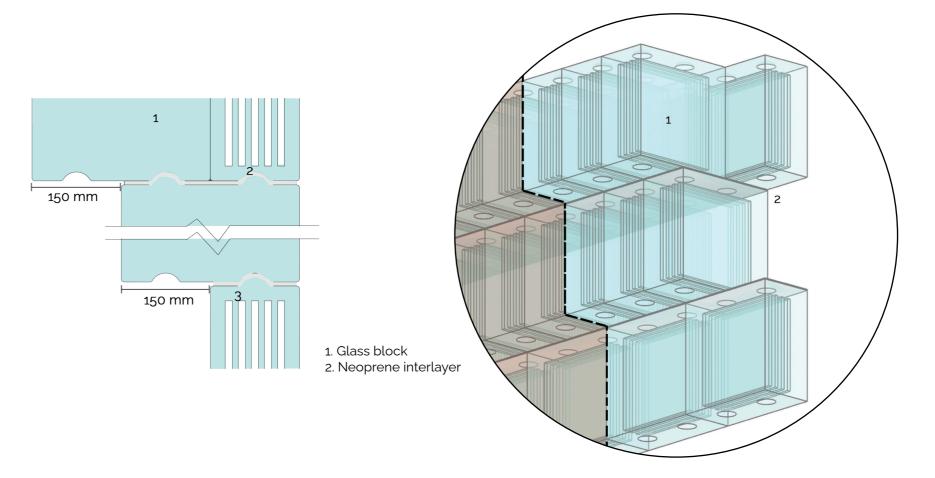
Figure showing (a) section detail (b) view of corbel window detail
